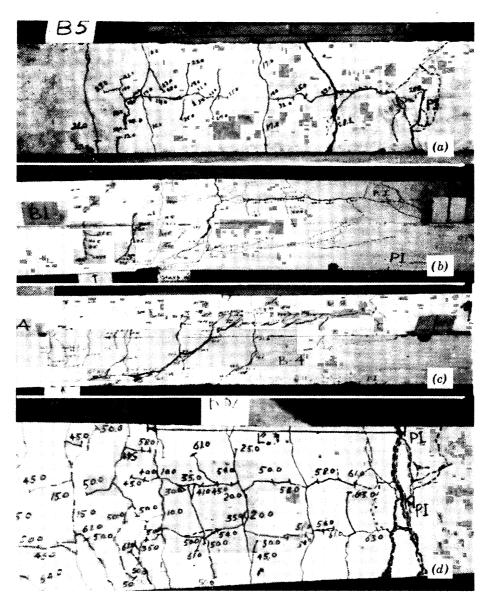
Bond splitting photographs of beams tested as shown in Fig. 14. (a) Splitting is directly over bar and runs lengthwise. The cross cracks are flexural cracks. (b) Failure chiefly from bond splitting. (c) Diagonal tension (inclined side crack) combined with longitudinal splitting to produce failure. (d) Splitting over two bars in beam with heavy stirrups
